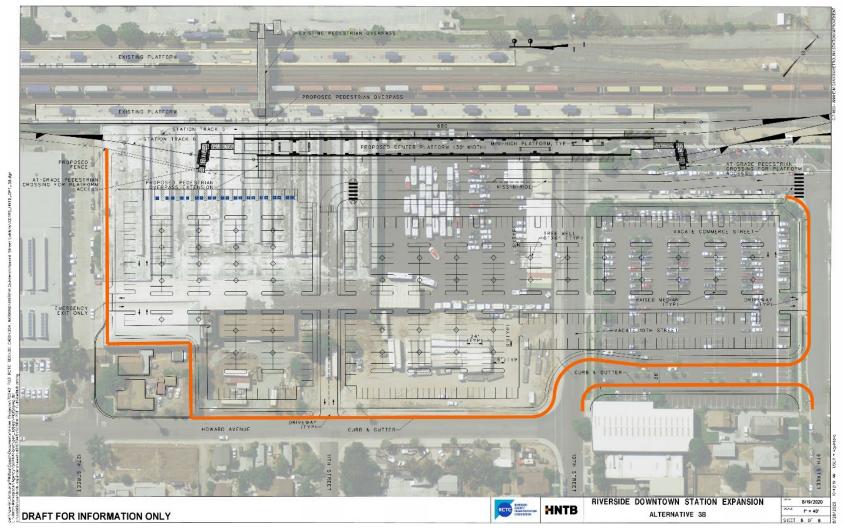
Build Alternative with Parking Design Option 2B Source: HNTB 2020
